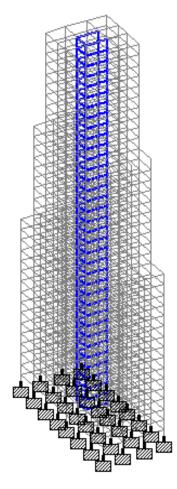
Geometric vertical irregular G+35 Building with Shear wall system in Core elevation
